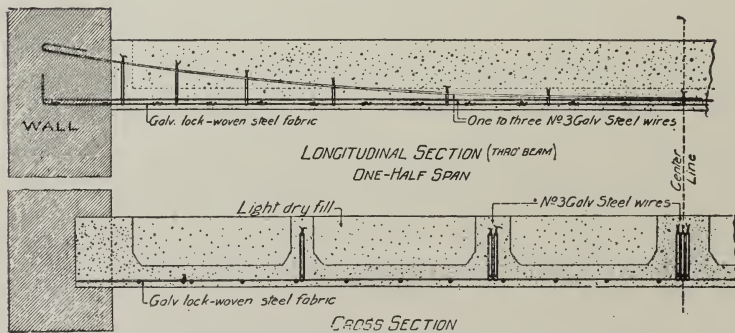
Lock-woven Fabric Floor Construction. Wide Span.
